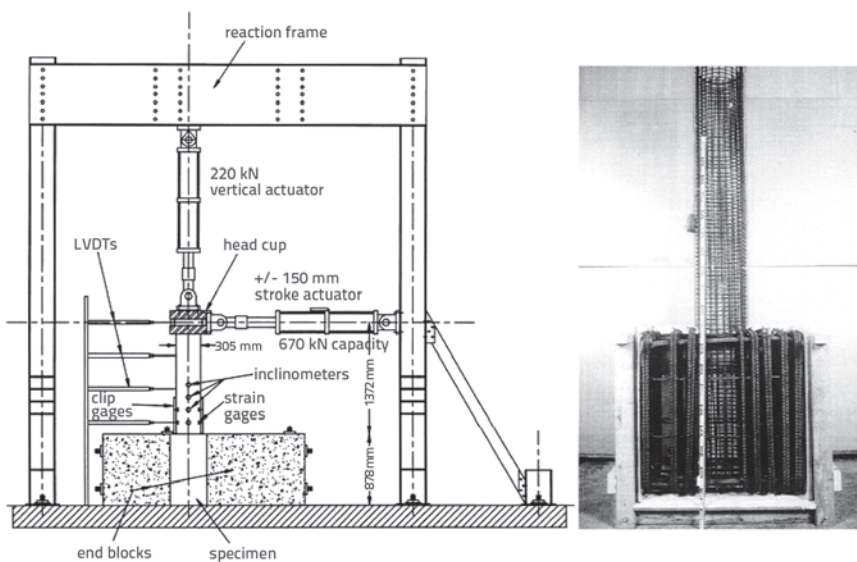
Details of load frame, test set-up and arrangement of reinforcement
